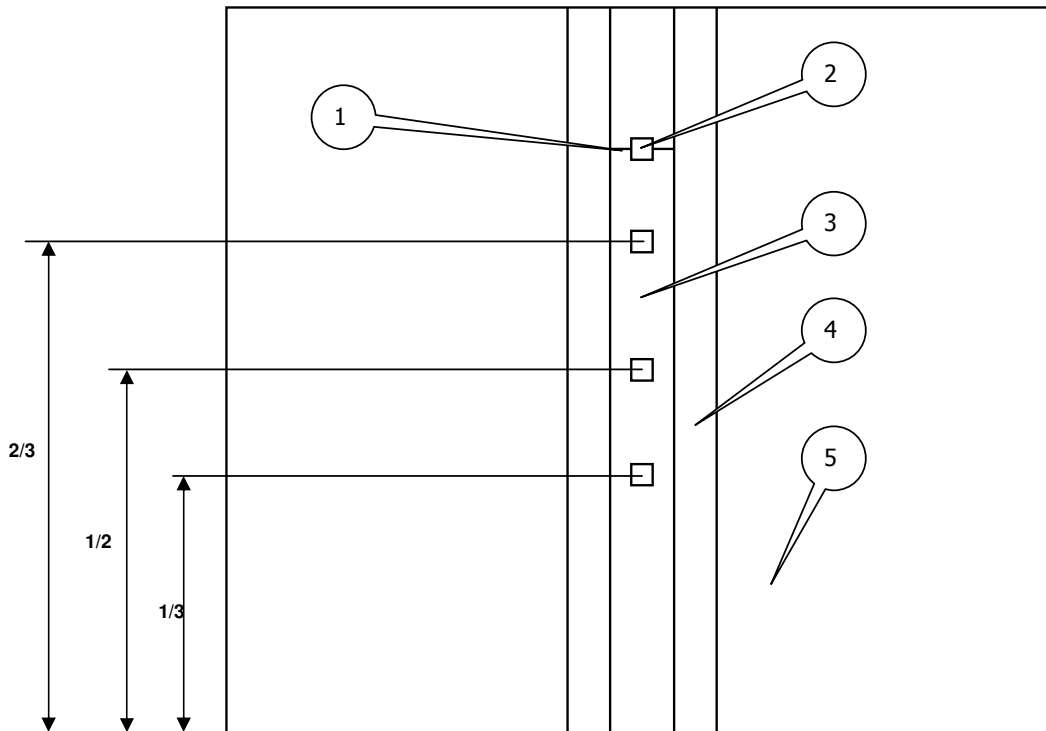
unexposed face thermocouples for vertically oriented cavity barriers within walls (elevation)/horizontally cavity barriers oriented within walls (plan)
